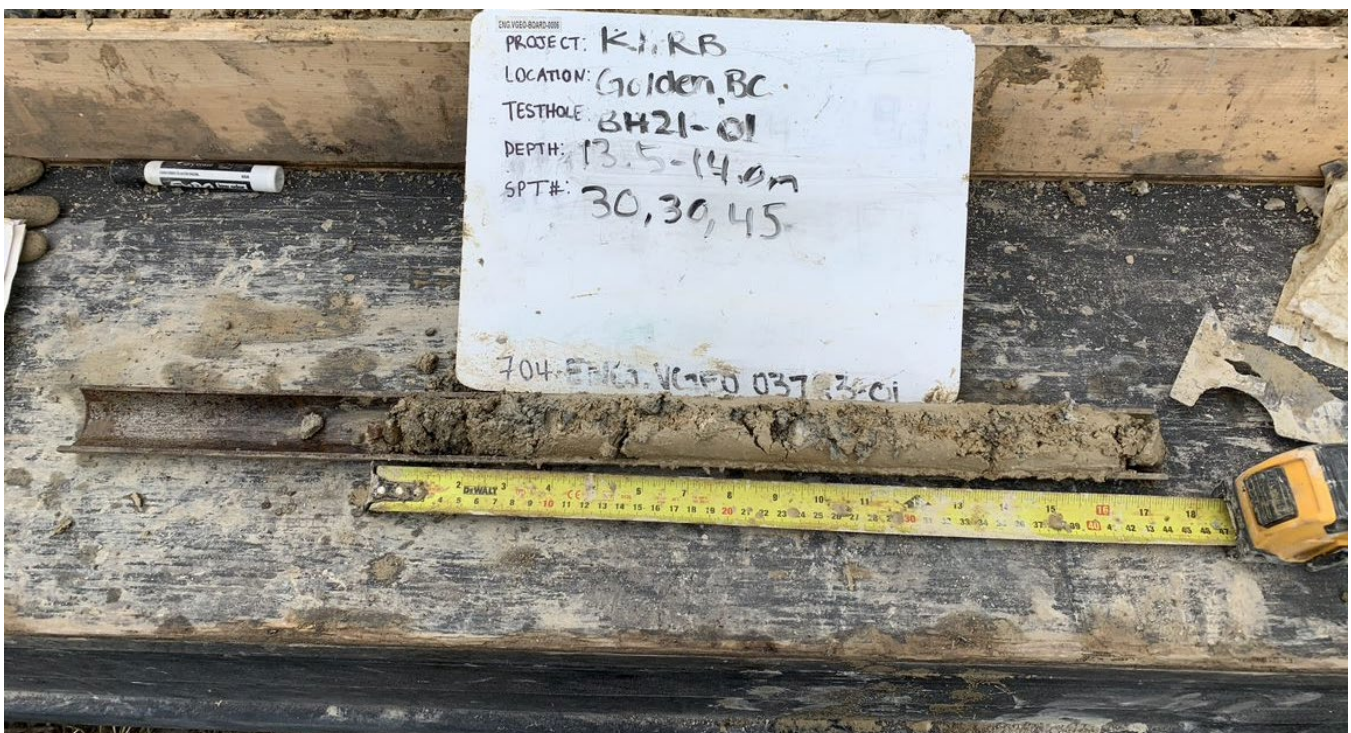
BH21-01, SPT-08, 13.5 m to 14.0 m
